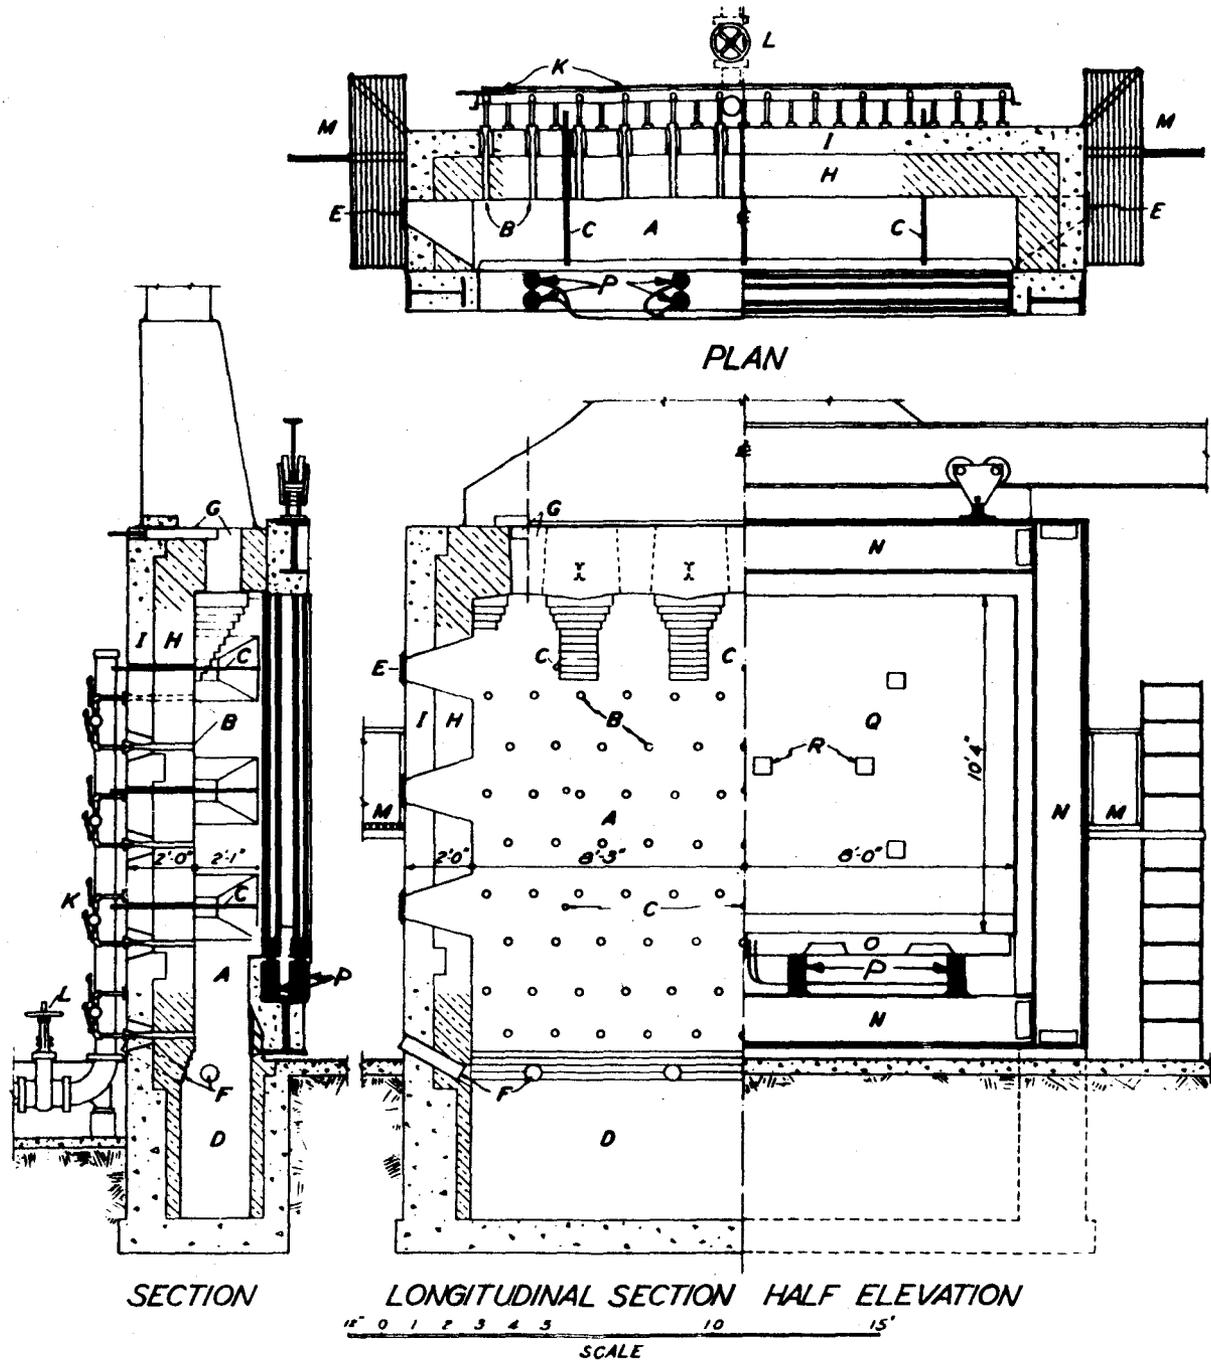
DETAILS OF WALL-TESTING FURNACE.
